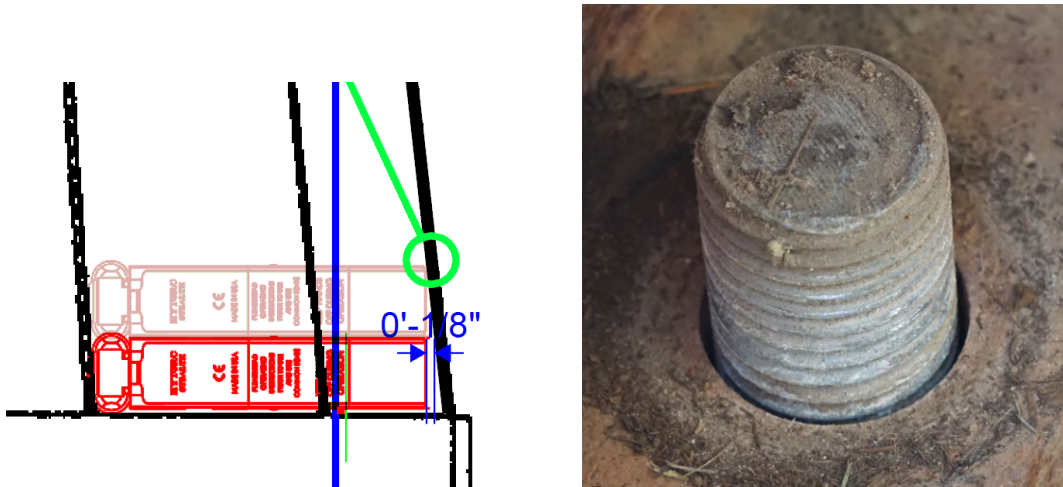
Wrench clearance issues (left) and anchor rod condition (right)
